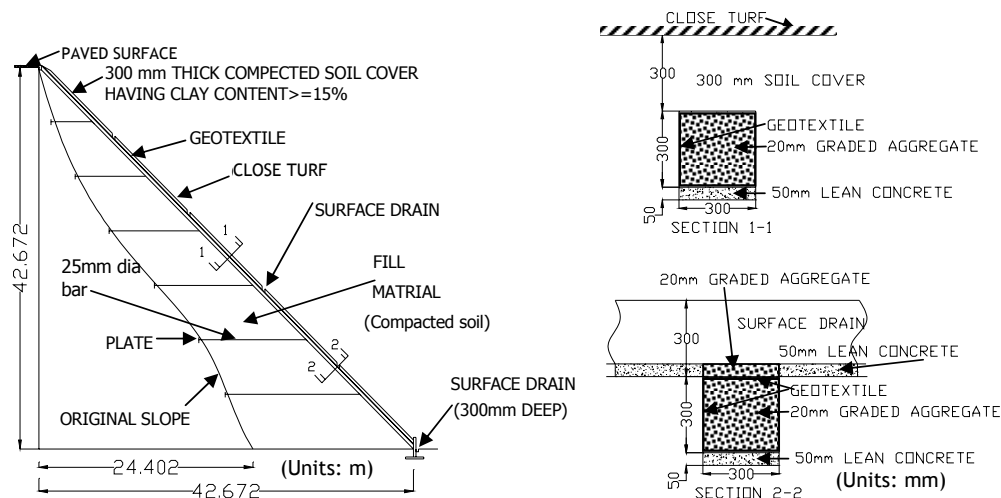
Layout and cross-sections of proposed remedial measures for slope stabilization.
